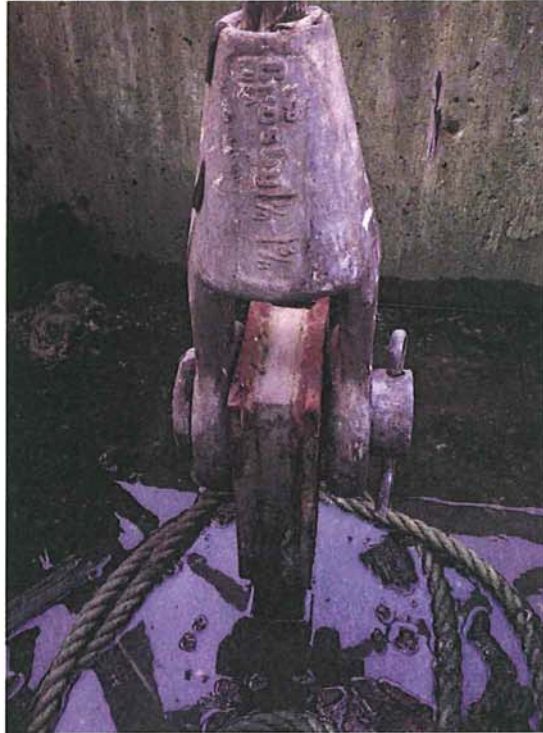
Typical counter weight cable anchor. Also note the surface corrosion on the connection plate.
